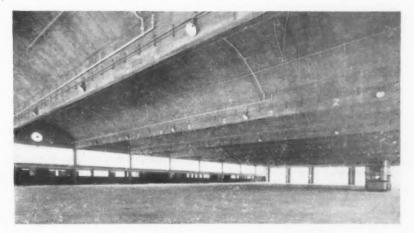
Prestressed barrel-vault-roof garage for the Bournemouth Corporation Transport Department
